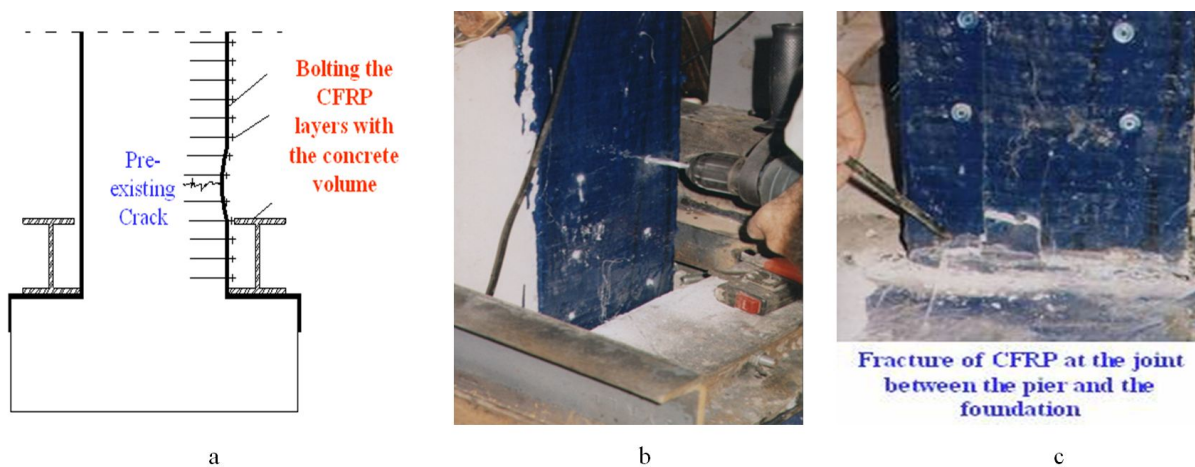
a The repair of specimen Rep-1 Pier A. b. The repair of specimen Rep-1 Pier A. c. Fracture of CFRP for specimen Rep-2 Pier A.
